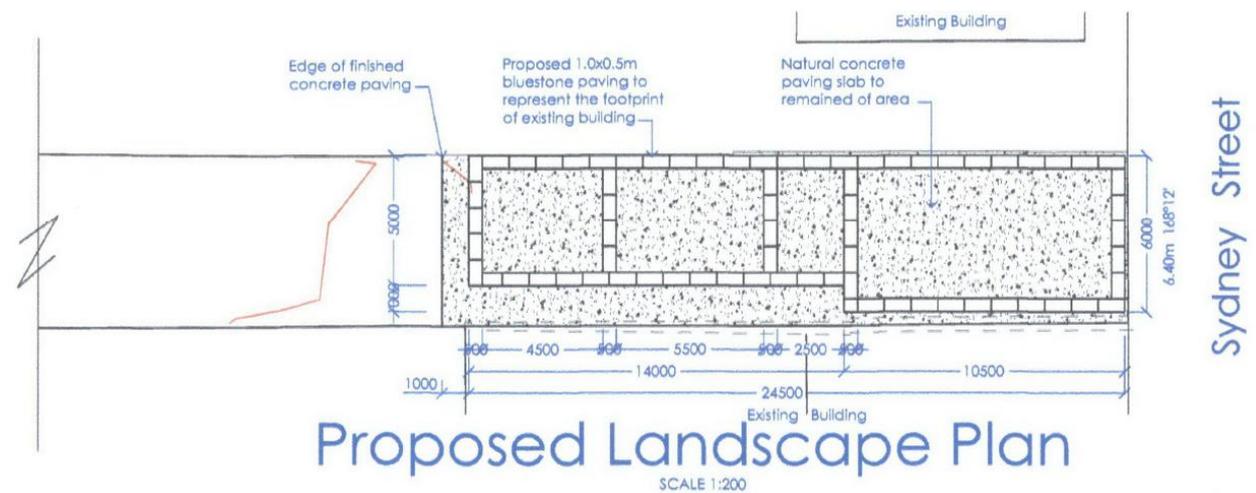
Proposed building and works to provide a ground level bluestone outline of the buildings.
